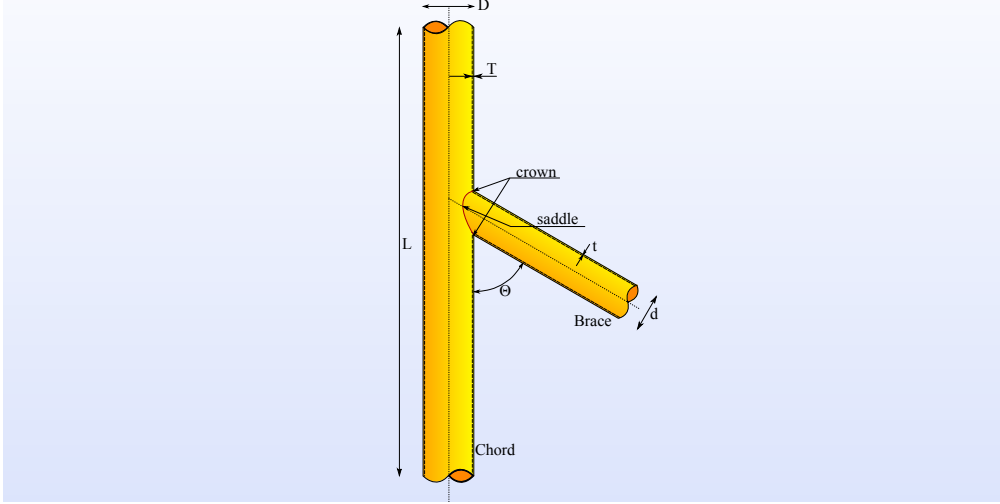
Geometrical definition for tubular joints. T/Y joint.
